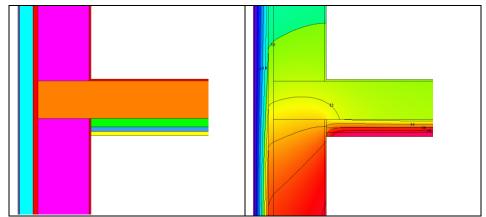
Wall – ceiling joint with 80 mm insulation. Model and temperatures.
